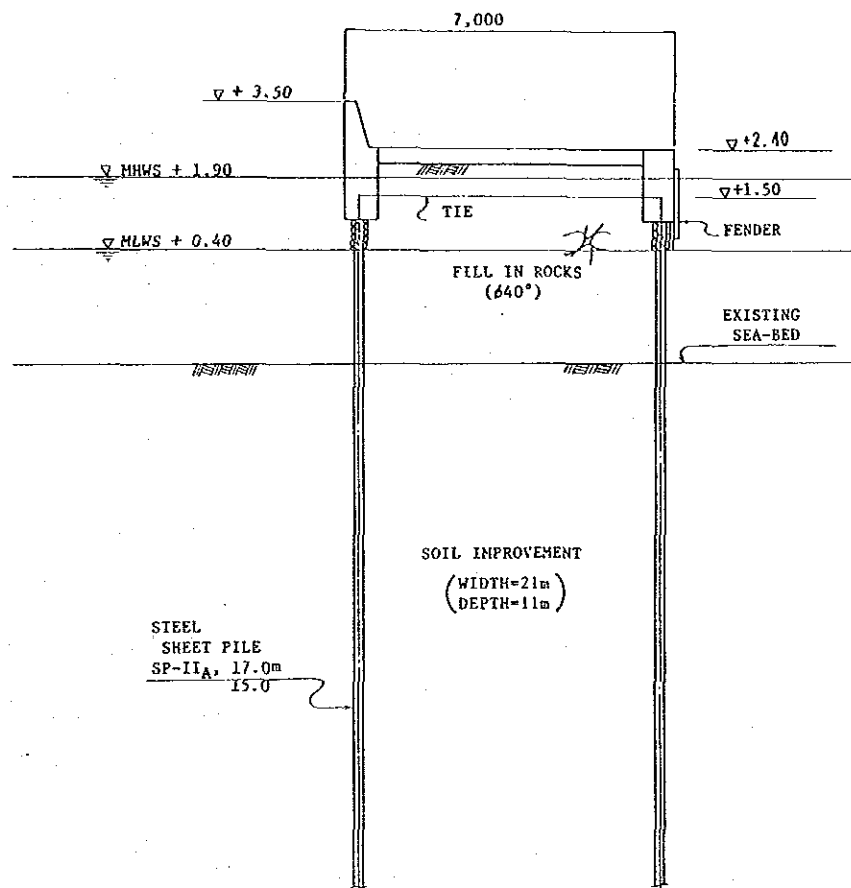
, TYPICAL SECTION OF BREAKWATER
